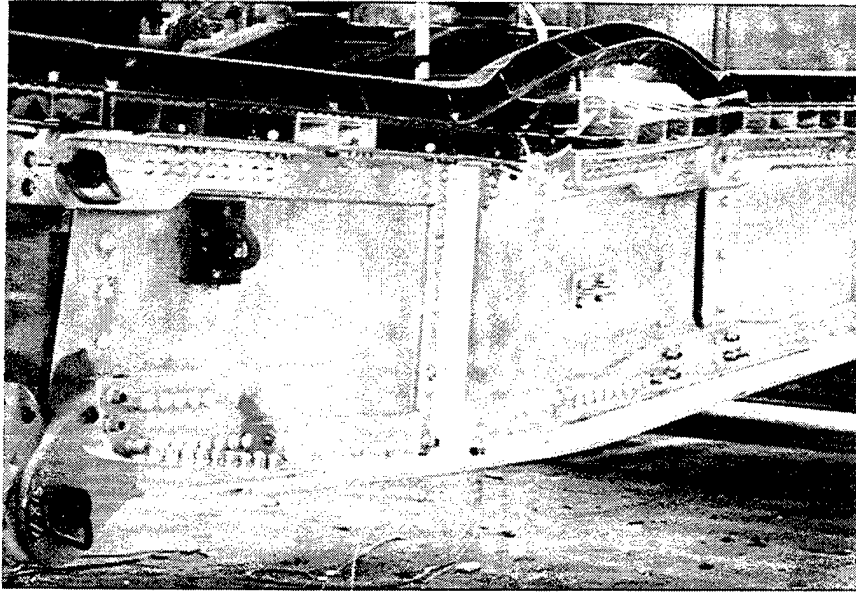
Close-up view of the buckled area in the No. 2 bridge in Figure 123. Note the extensive damages to the top chord, girder plate, extruded aluminum deck panels, and steel curb. The modified bottom chord angles did not crack, but bent at the buckled area.
